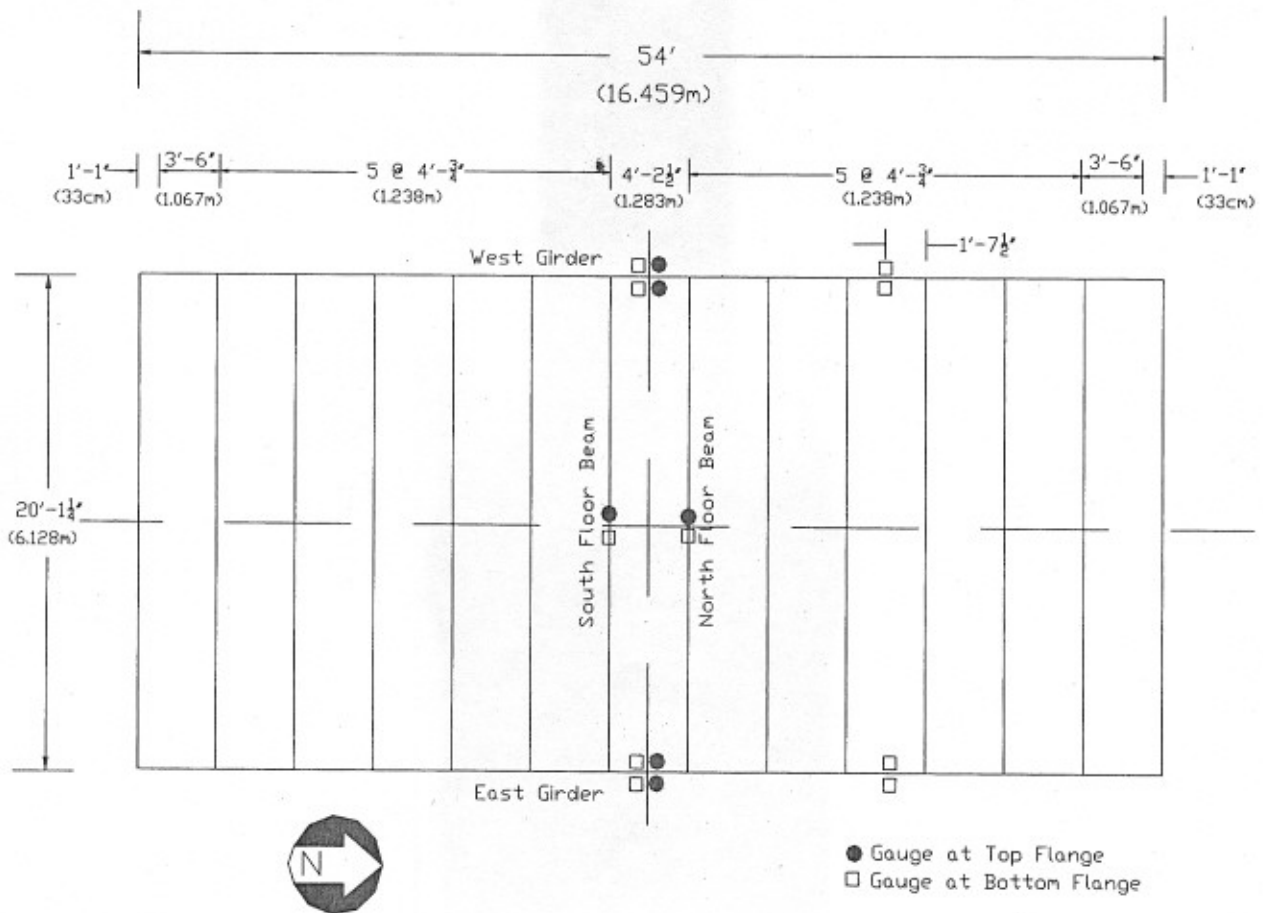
Plan view indicating strain transducer locations, Bridge #21.
